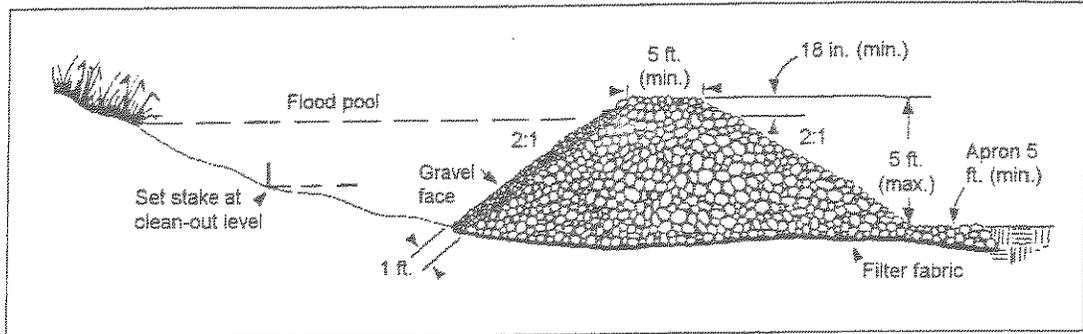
C. Cross-sectional view of the stone outlet section.
